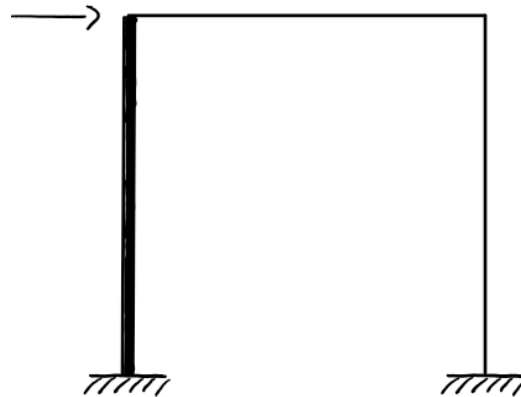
Fixed base portal frame where the left column is significantly stiffer than the right column and the beam, subject to a horizontal load in the top left corner.
